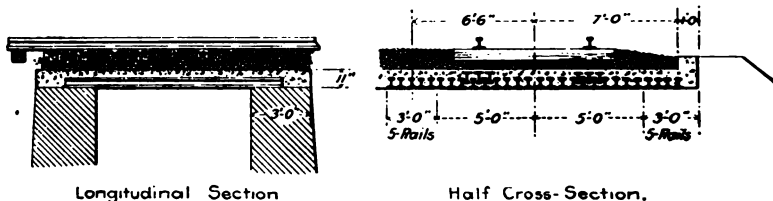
Steel Rail Bridge, B. & O. R. R.
